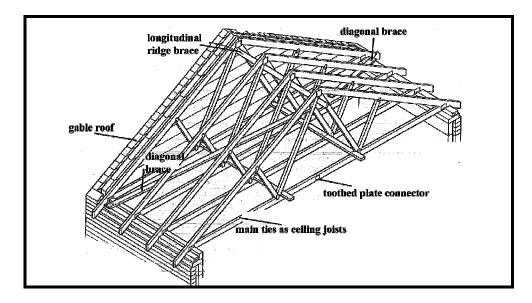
Trussed rafter roof construction (Foster, 1983:191).
